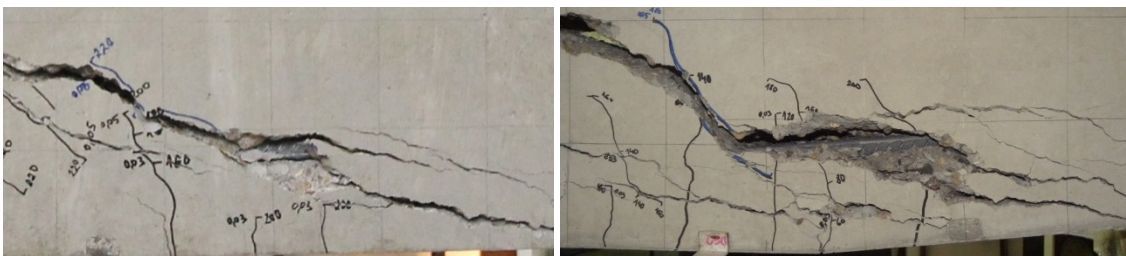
Failure cracks in OPC-1 and HVFAC-1 in the zone close to support
